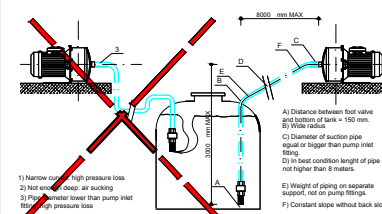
DETAIL 'D' TECHNICAL ROOM IMPLANTATION
